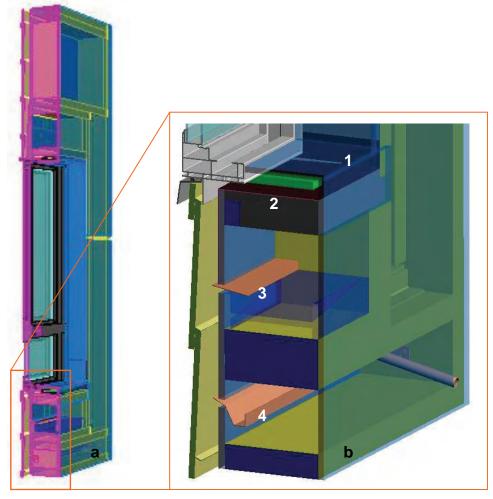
Vertical wall sections facing interior (a and b) showing location (b) of water collection troughs at (1) window on interior side of test specimen, (2) beneath window in false subsill; (3) beneath subsill for collection of water drained from subsill (see Fig. 4) and, (4) lower most trough for collection behind siding.
